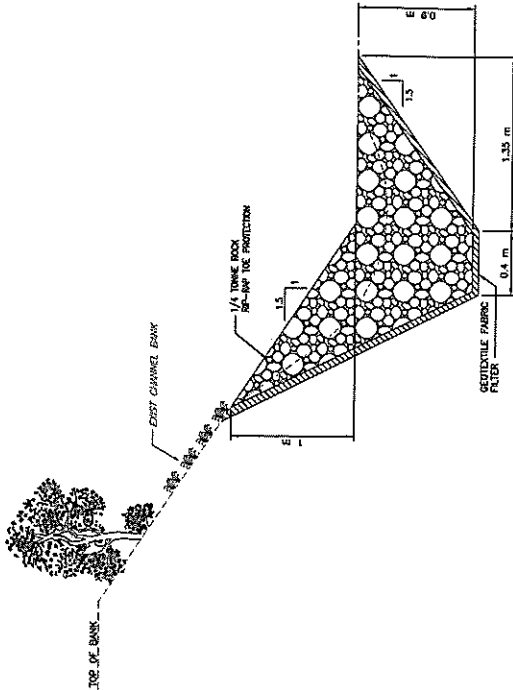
ROCK GRADE CONTROL STRUCTURE
